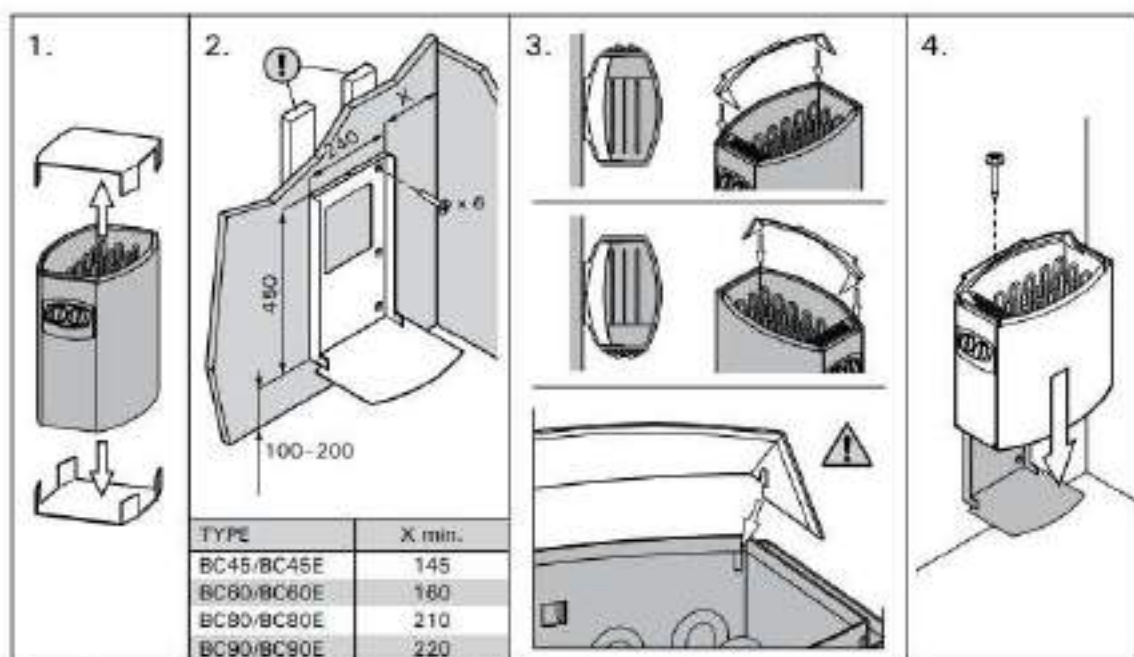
Fastening the heater on a wall (all dimensions in millimeters)
